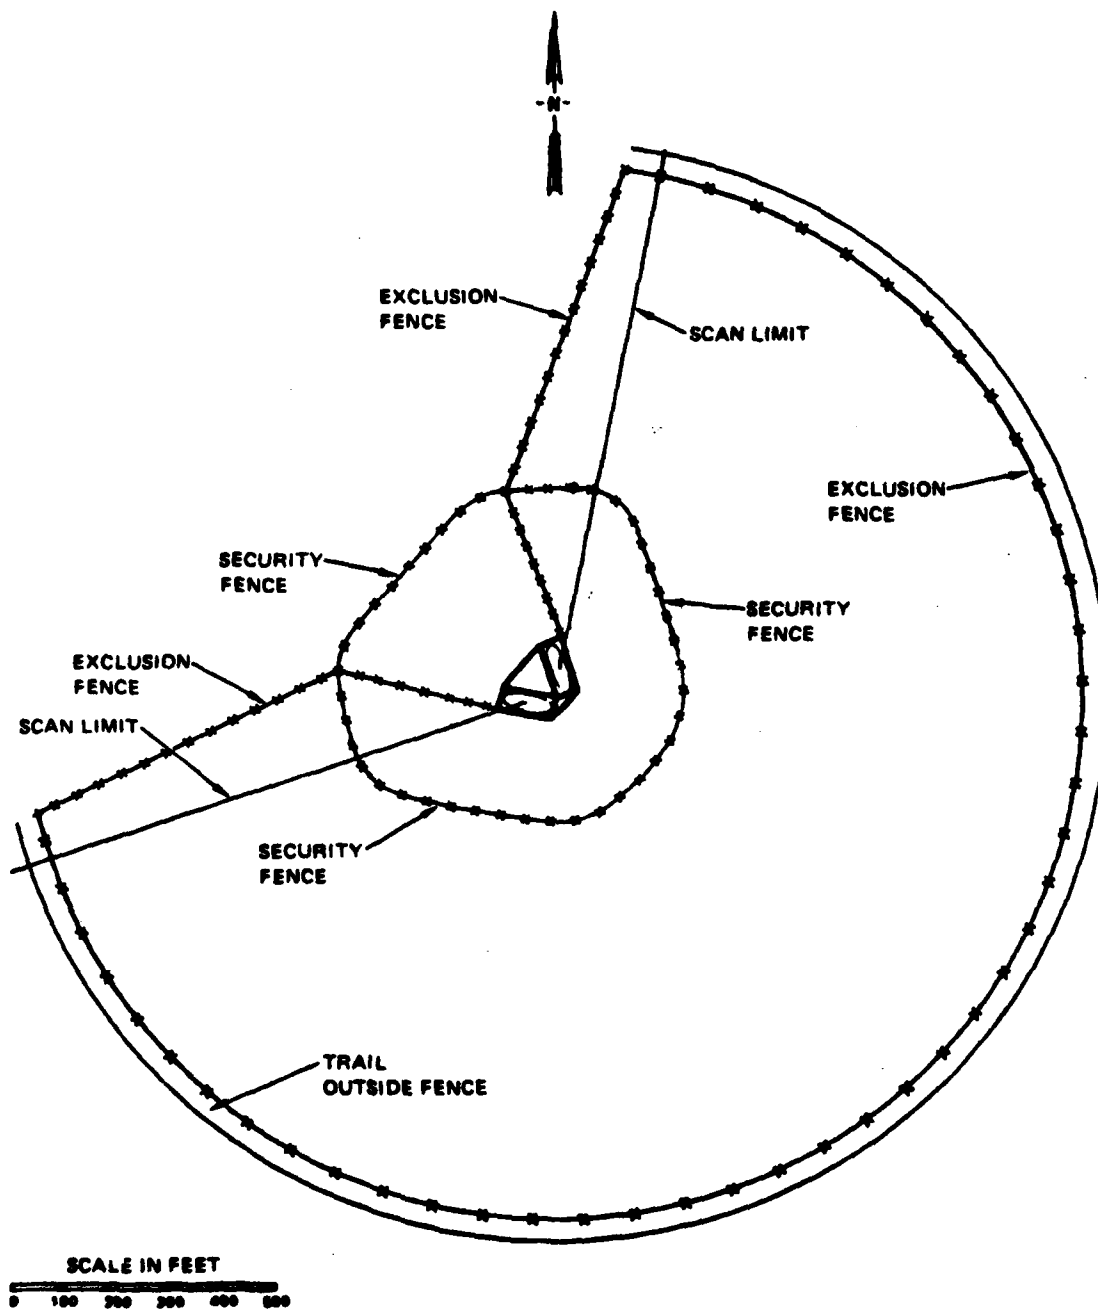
TYPICAL SITE PLAN FOR SEPP
